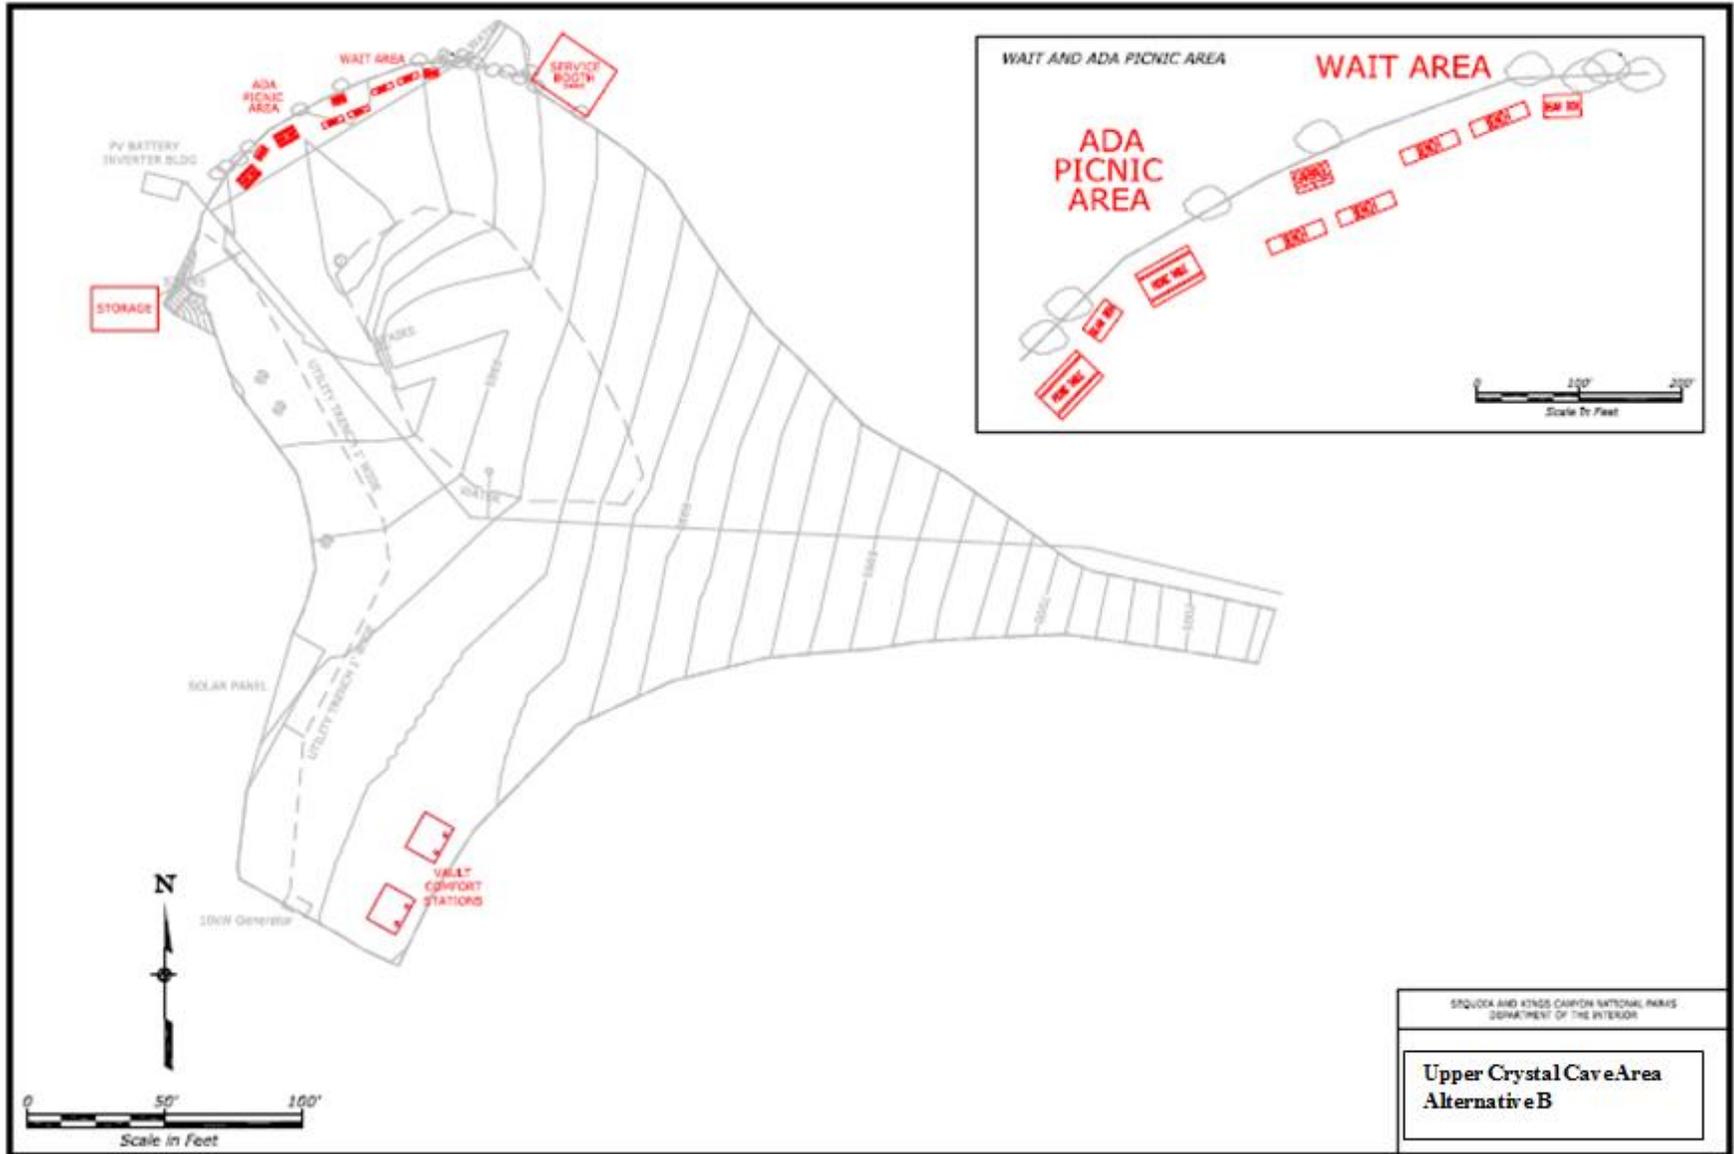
Layout of the Upper Crystal Cave Area under Alternative B.
